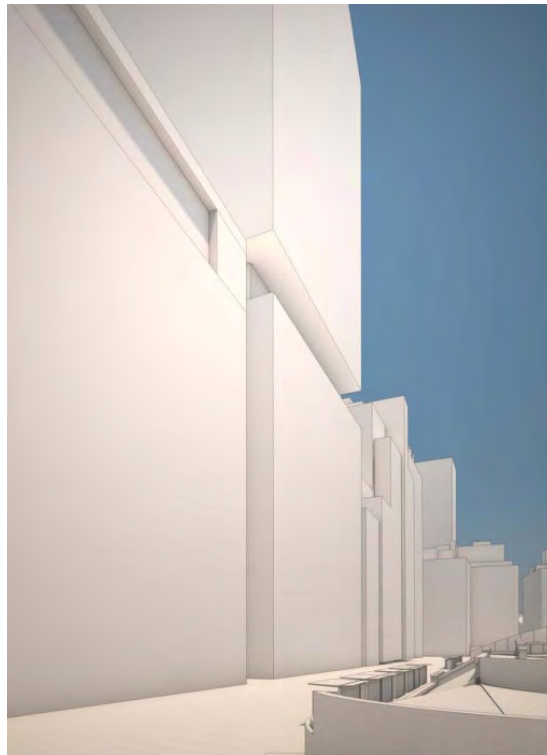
3.5m setback on Carrington Street between RL 63.6 (45m) and RL76.6m (55m) responding to parapet level of Shell House
